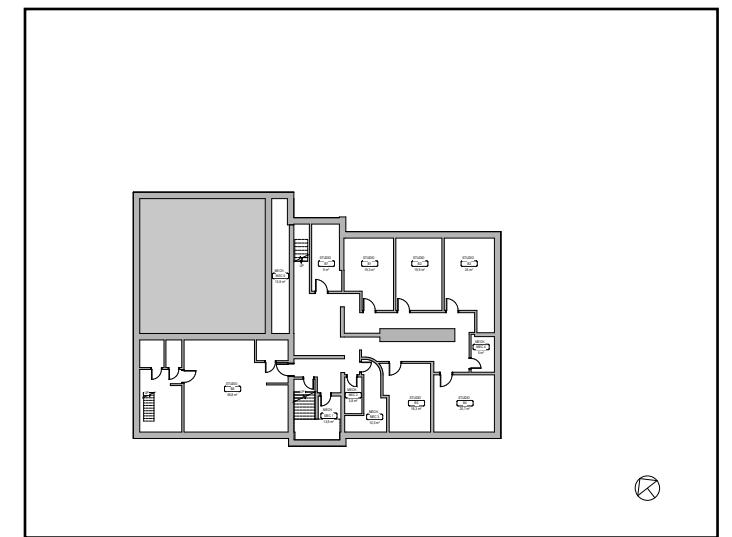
827 Gordon Street basement plan. Prepared by EVOQ.
